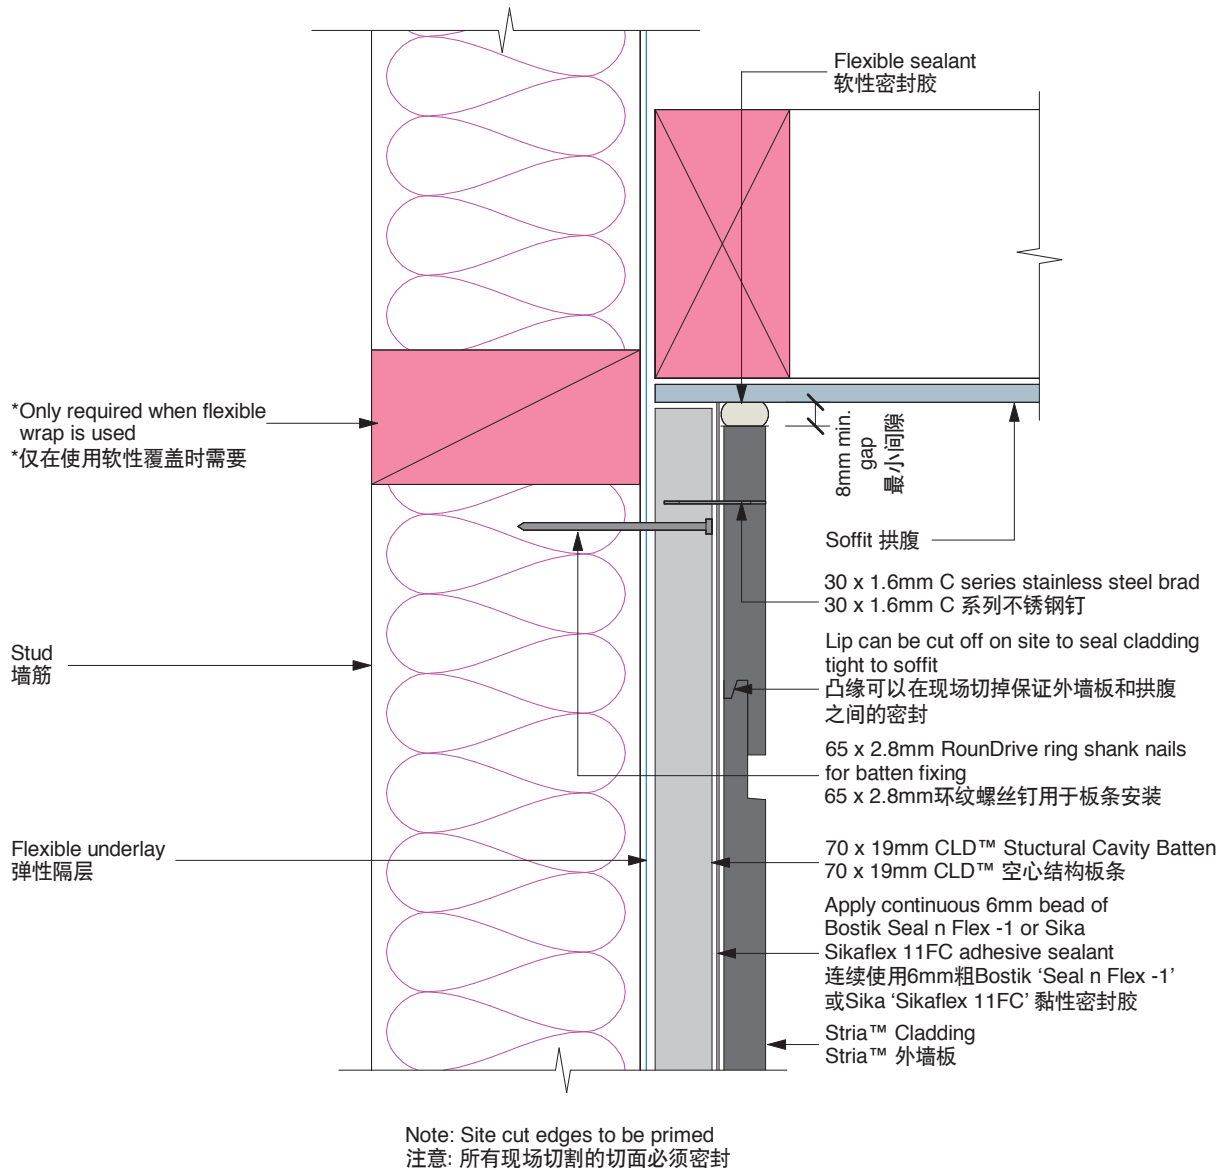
Nil soffit detail | 图14: 零拱腹详图
